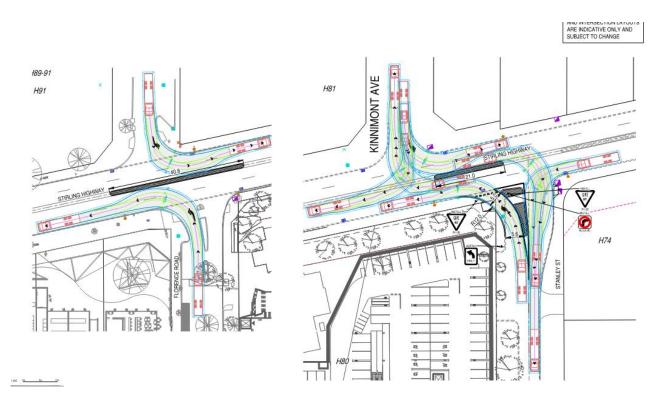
Proposed Modified Intersection at Stanley Street and Florence Road based on the Traffic Impact Report (refer Appendix Eleven)
